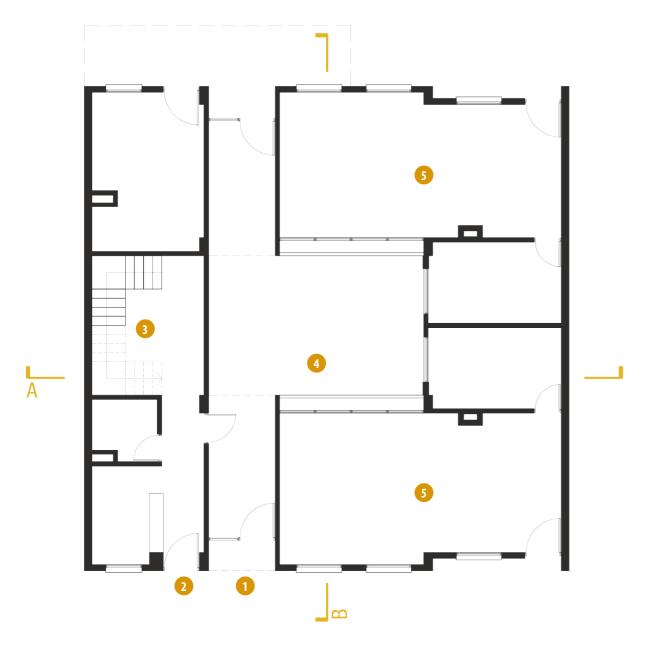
TYPOLOGY A\_GROUND FLOOR PLAN
